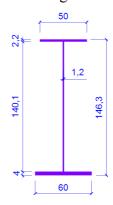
Cross section of an extra steel beam (annotations in cm)
